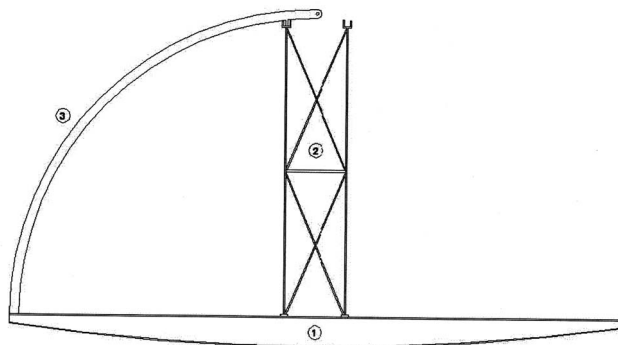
Erection of the main structure: 1-floor; 2-scaffolding; and 3-arch segment
